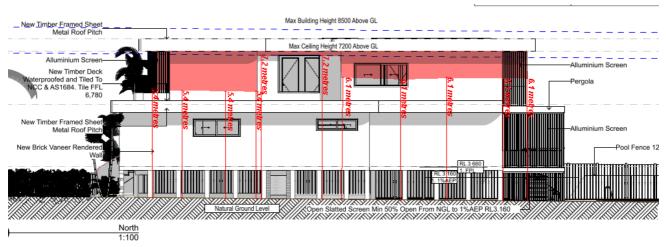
North Elevation (red highlighting building envelope numerical non-compliance)
